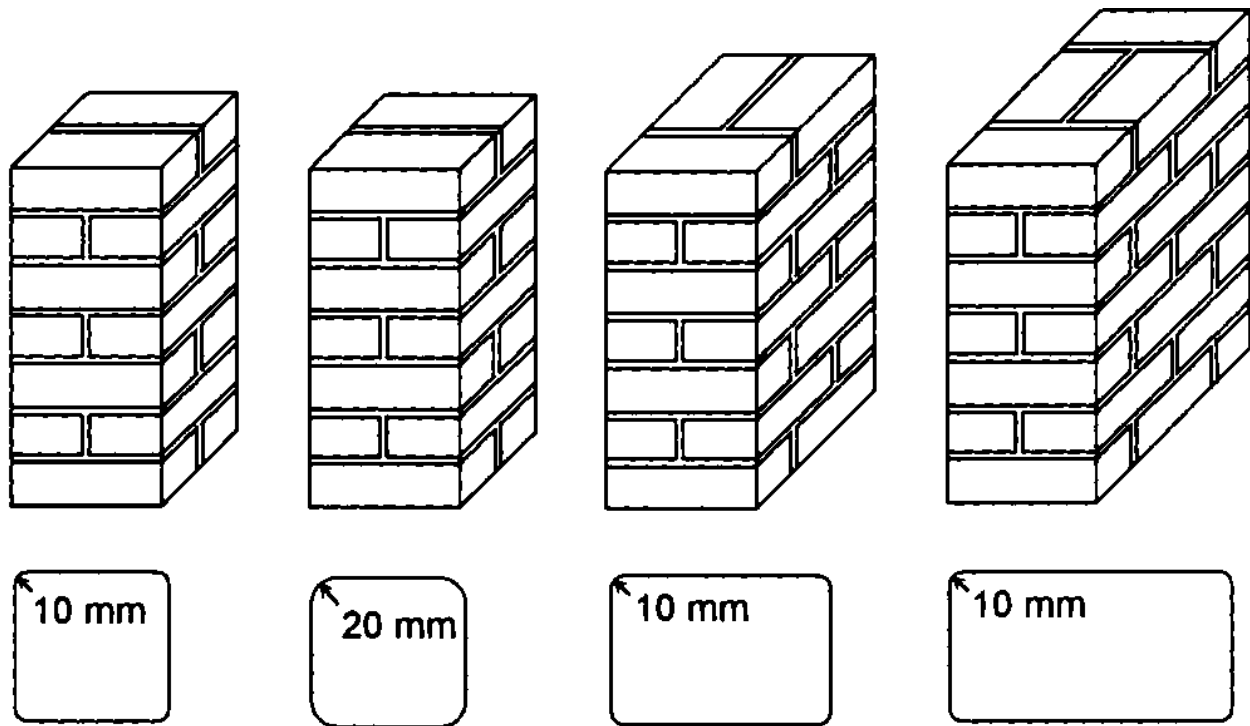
Configuration of clay brick masonry columns (Krevaikas and Triantafillou, 2005).
